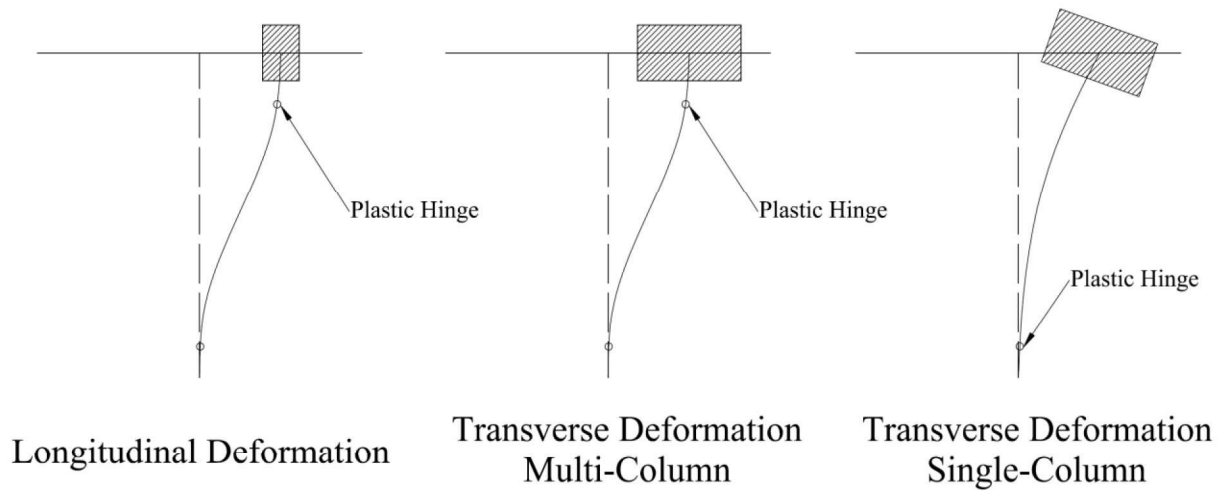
Deflected shape of pier column in longitudinal and transverse directions.
